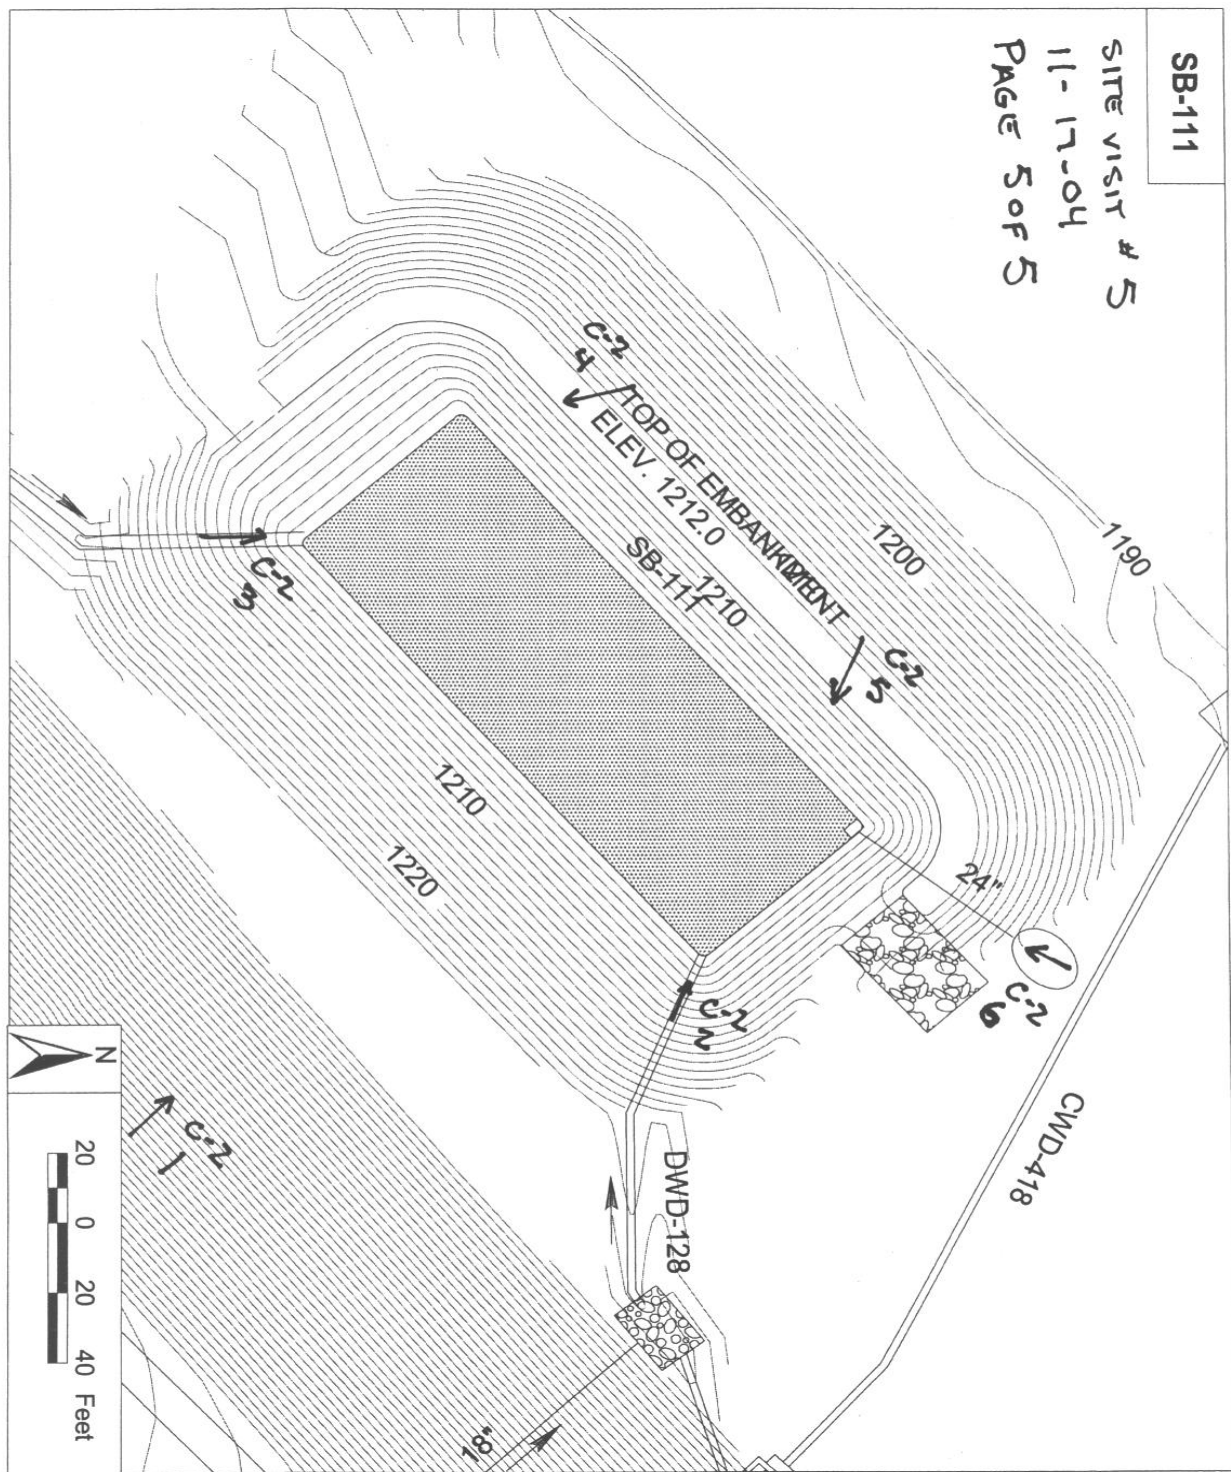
Elevation of SB111 showing basin topography, inlets and outlet
